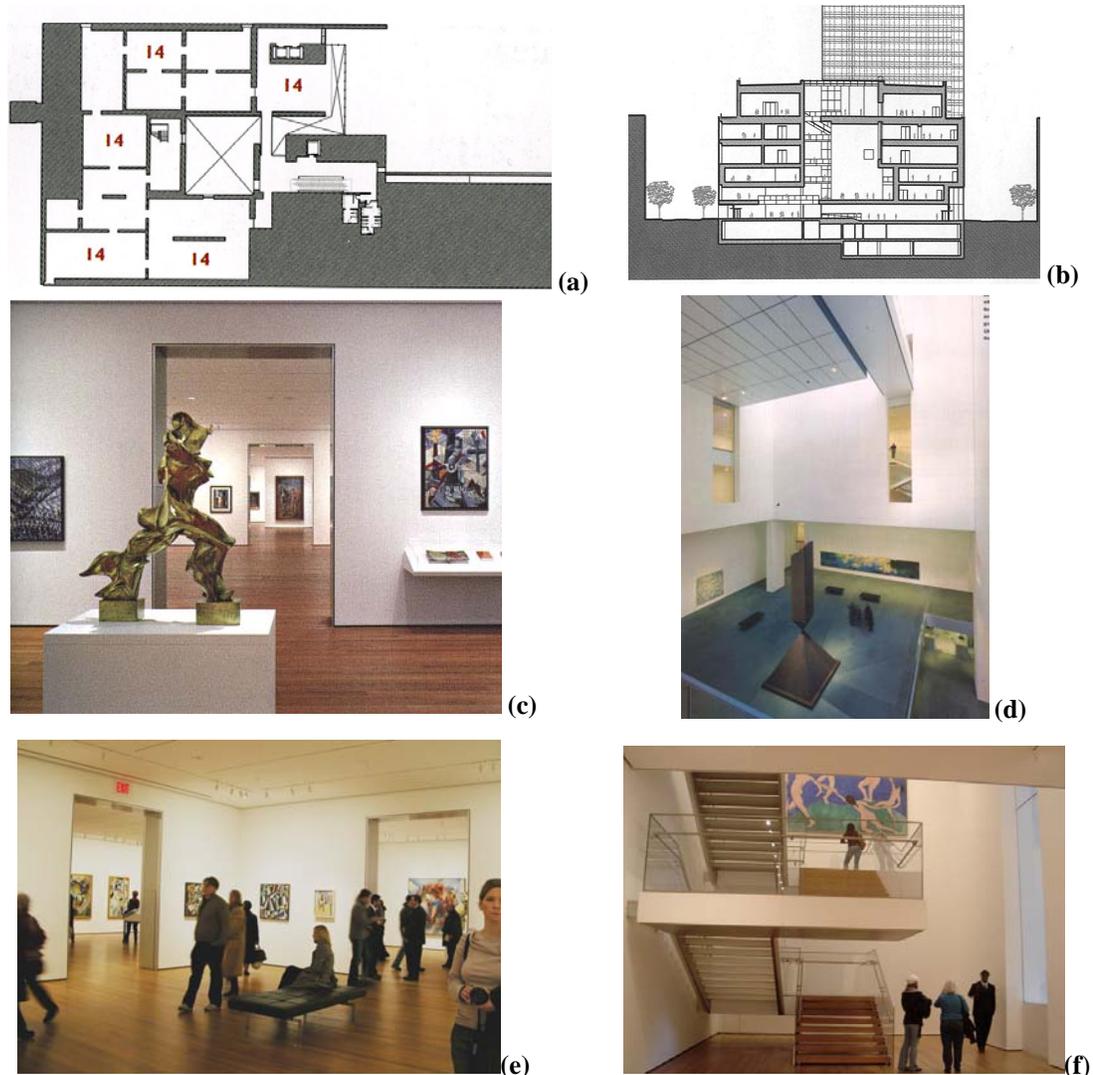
The new Museum of Modern Art, 2004, by Y. Taniguchi (a) fourth floor in the new main gallery building, (b) transverse section, (c) a view from fifth floor galleries (photo source: Architectural Record), (d) atrium, (e) a view from fifth floor galleries (photo: Sophia Psarra); (f) view from the staircase connecting fourth floor to fifth floor (photo: Ying Xu)
